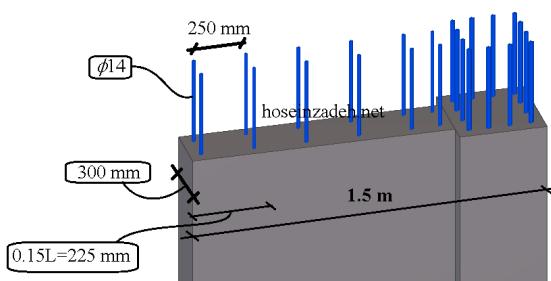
Locations of longitudinal reinforcement required by 18.10.2.4(a) in different configurations of wall sections.
